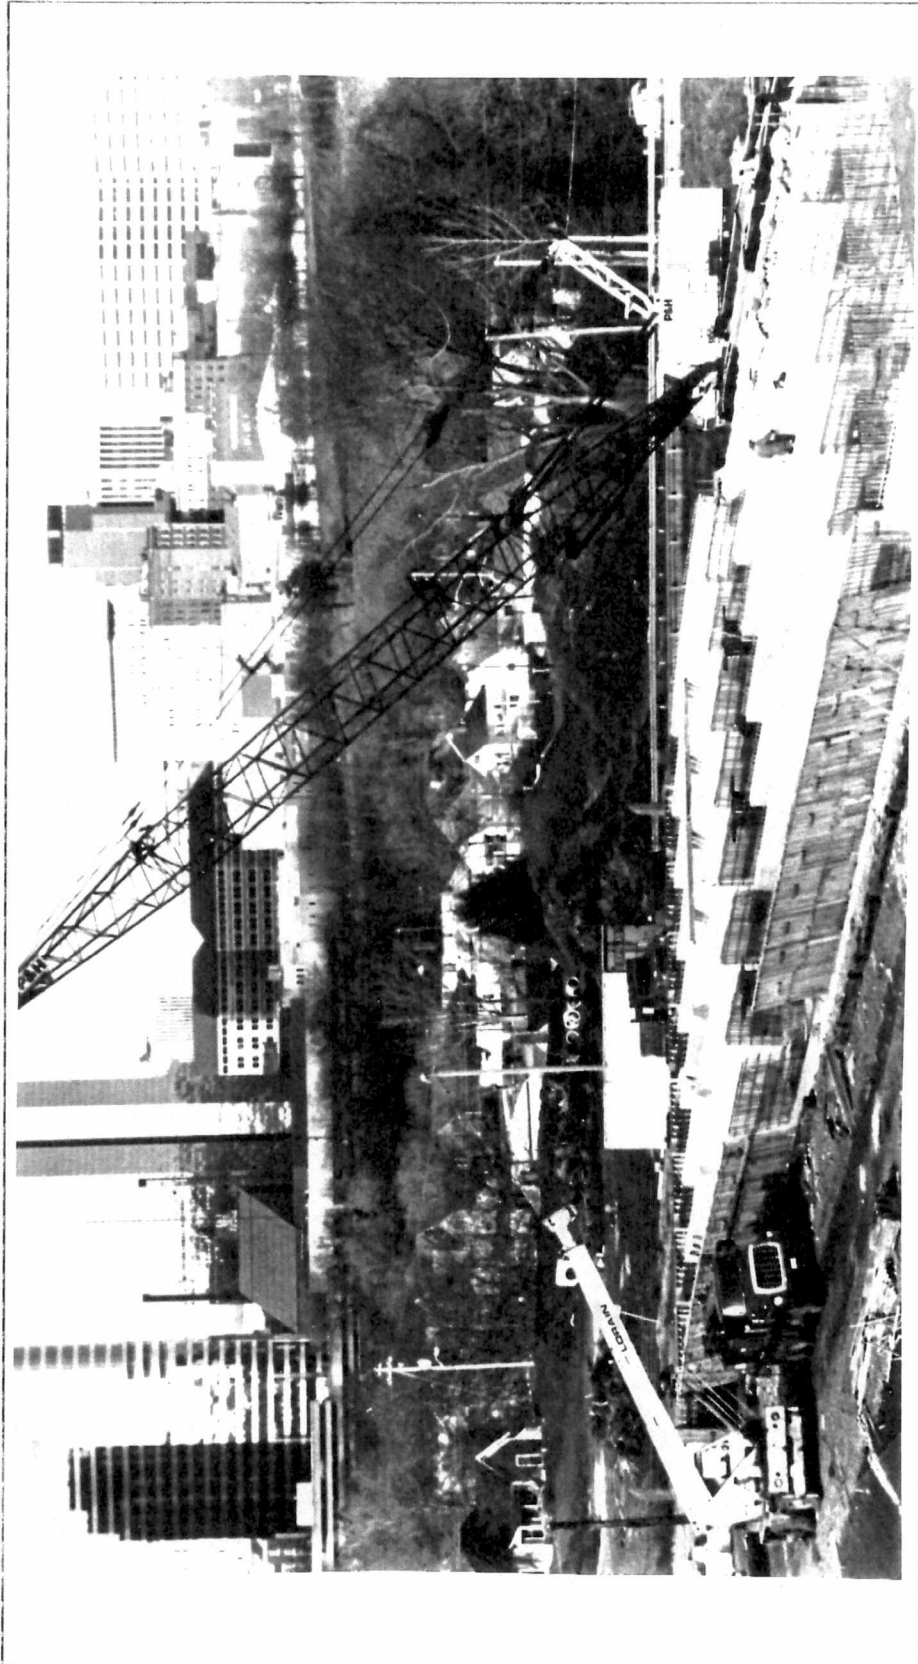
Construction of a cast-in-place concrete box girder bridge
